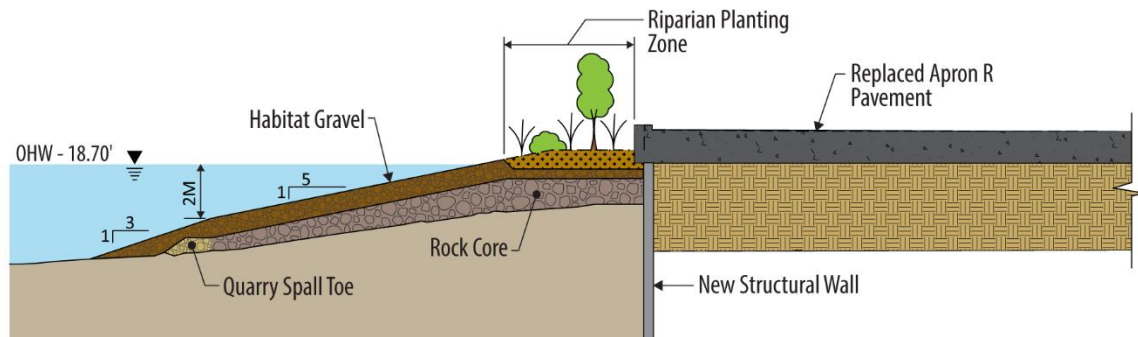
Typical Cross Section of Habitat Enhancement Fill
